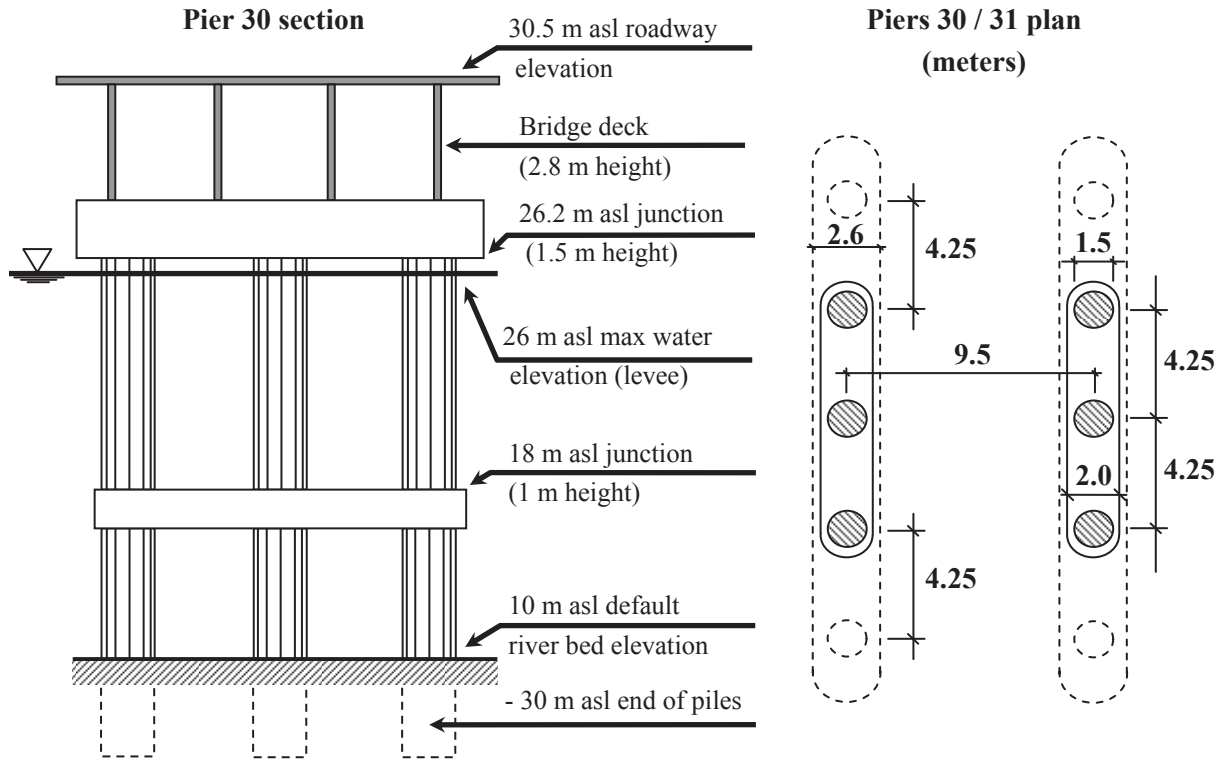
Pier 30 section and plan. All elevations expressed in meters above sea level (m asl).
